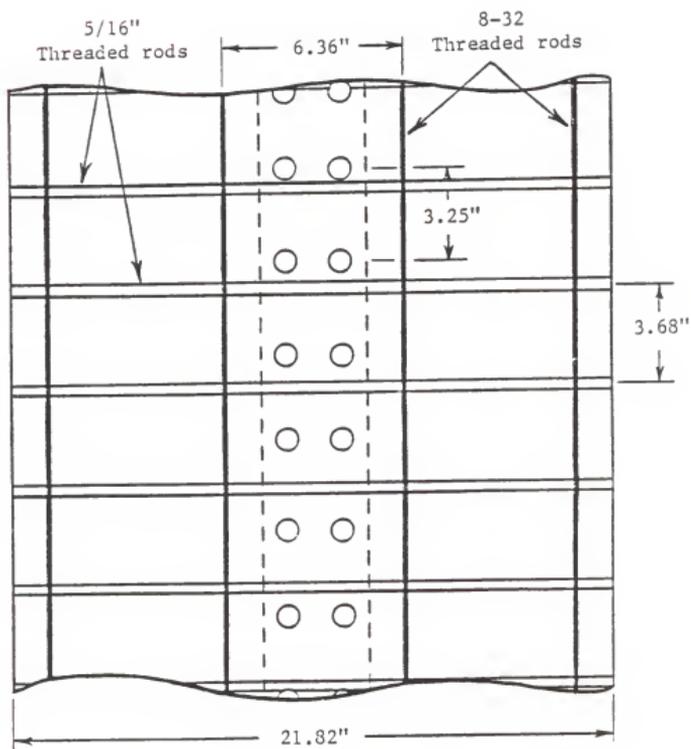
Plan View of Model Slab, Reinforcing Steel, and Studs
